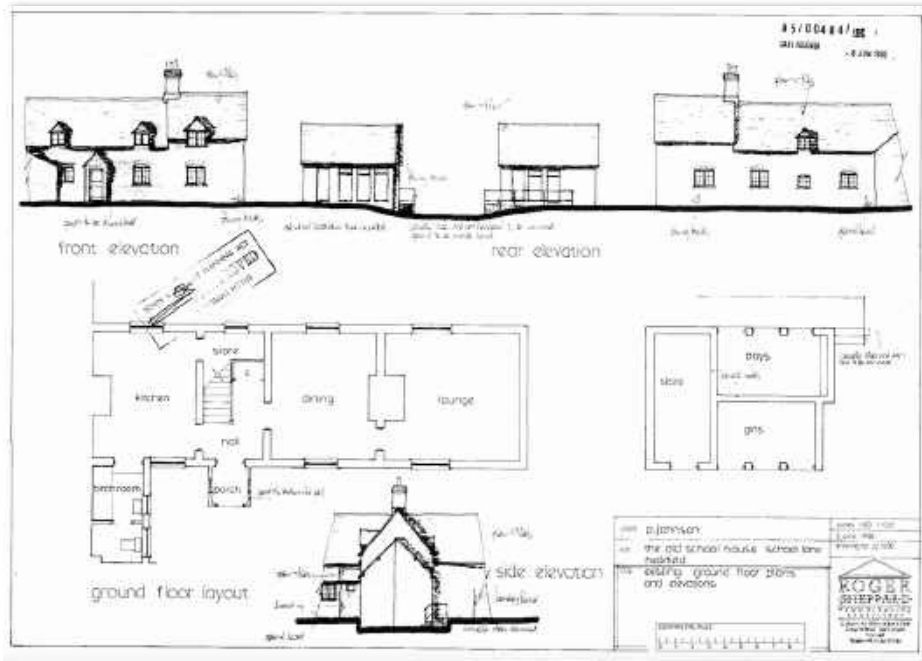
Heckfield Church of England Primary School building, (The School House) planning application – BEFORE!
